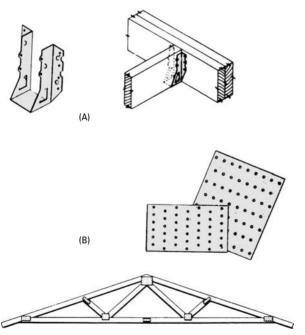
(A) One useful kind of framing fastener is the joist hanger. (B) Perforated plates such as shown can be used to make trusses. (Courtesy of Teco.)
